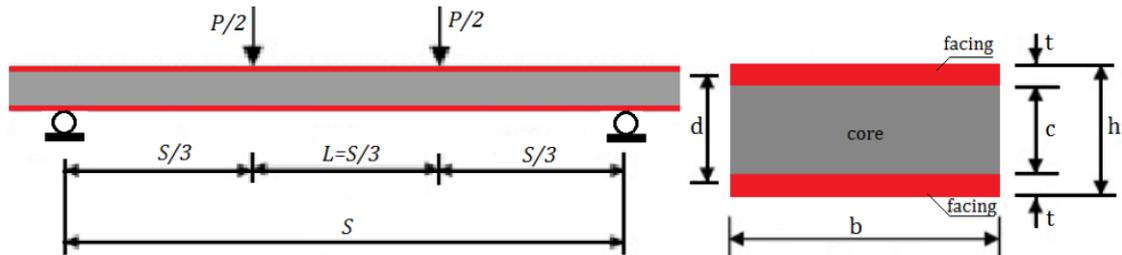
Four-point bending test layout and sandwich beam cross-sectional property.
